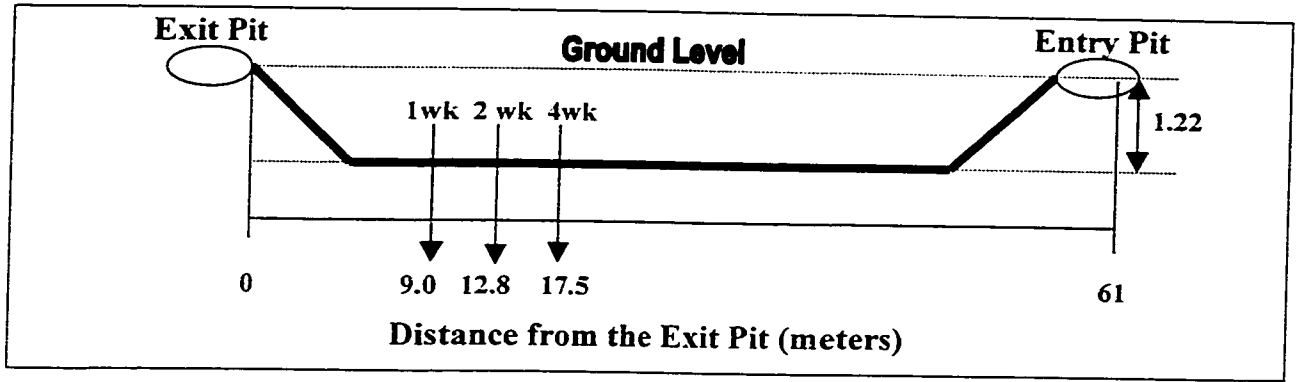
Elevation View of the 300mm Pipe Installation in Clay
